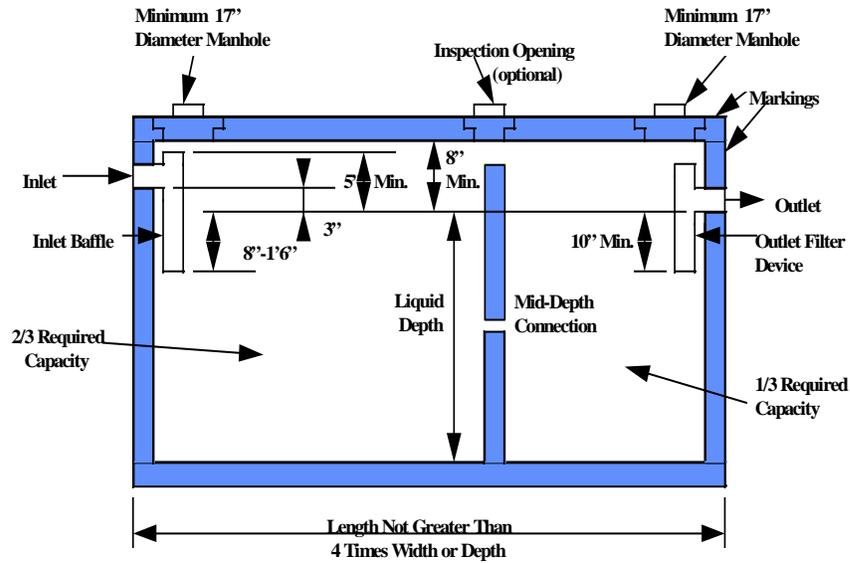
TYPICAL SEPTIC TANK
